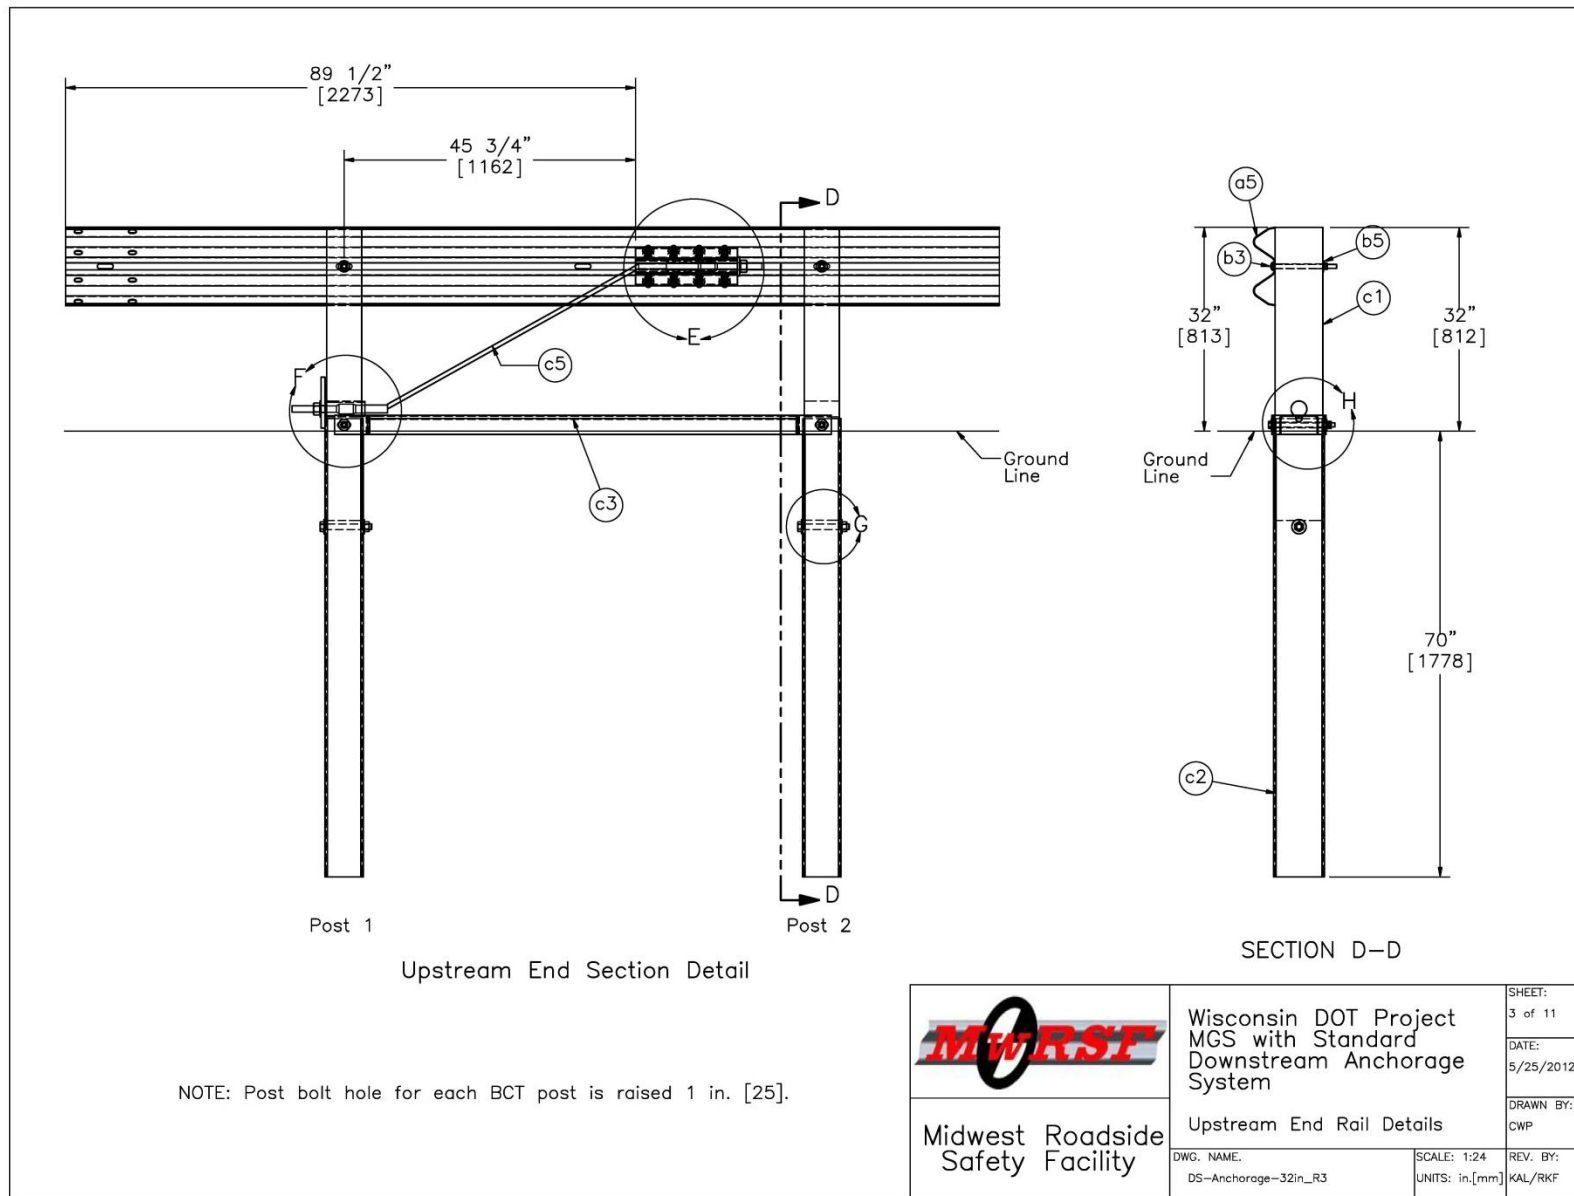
Upstream End Anchor Details, Test No. WIDA-2
